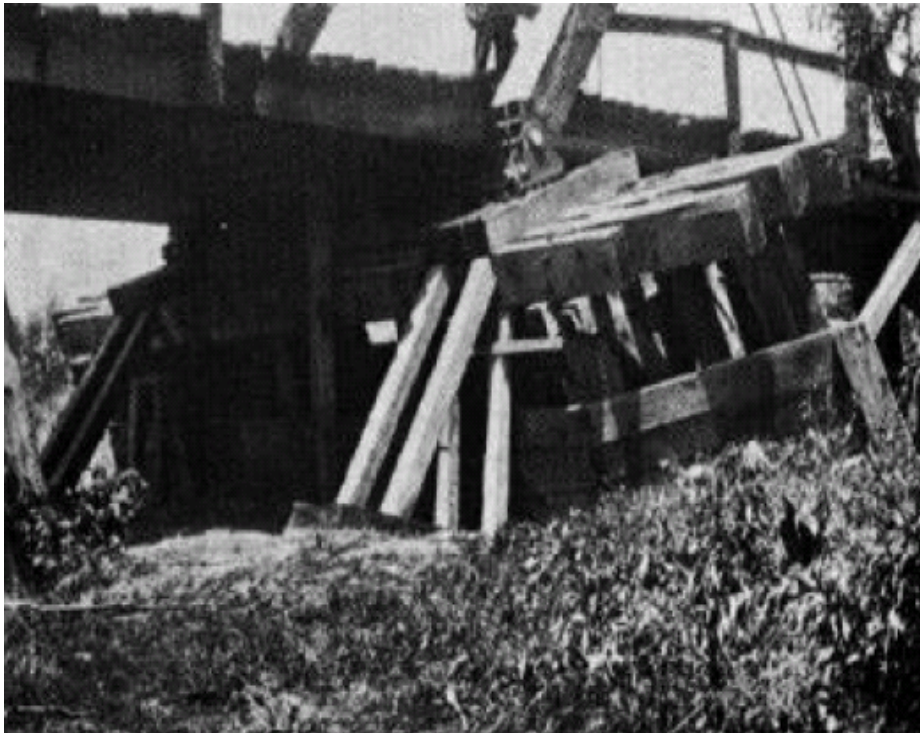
Failure of pile supported pier of the Salinas bridge during the 1906 San Francisco earthquake (Wood, 1908)
